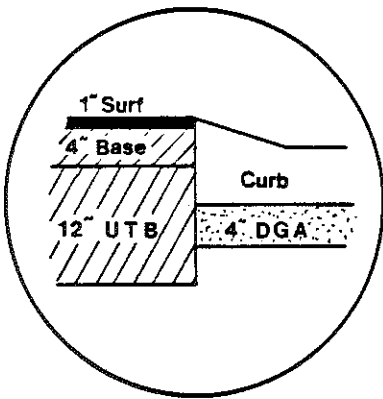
Typical Section and Detail for Main Line Section STA 793+00 to STA 915+00 (Section D).
